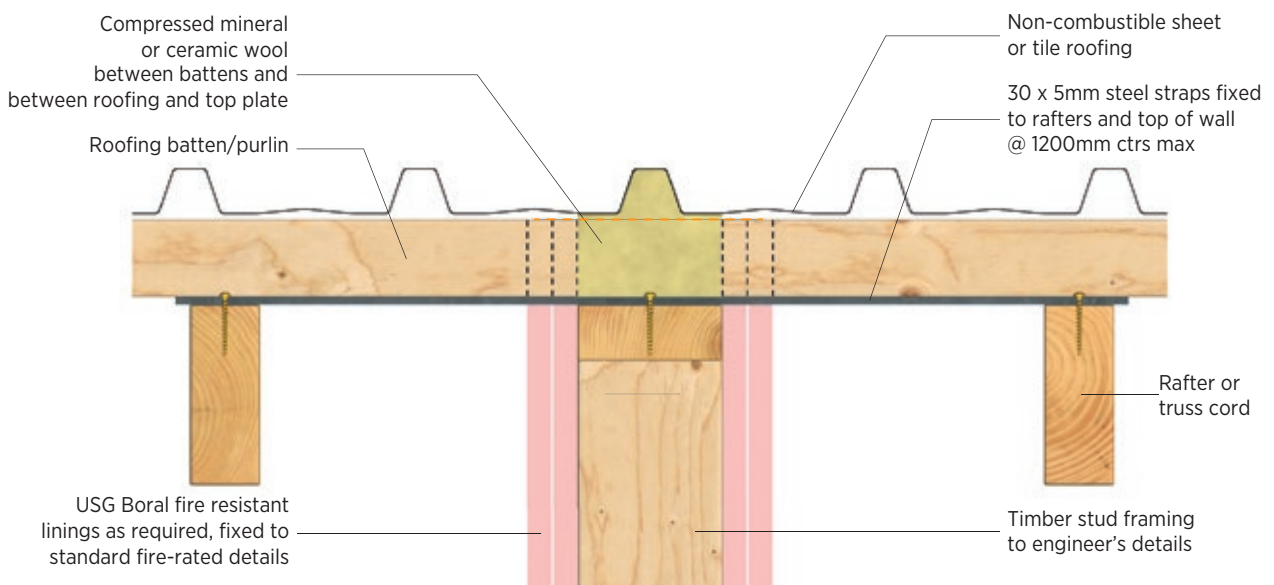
Standard Timber Stud Wall - Head to Roof Junction Detail
